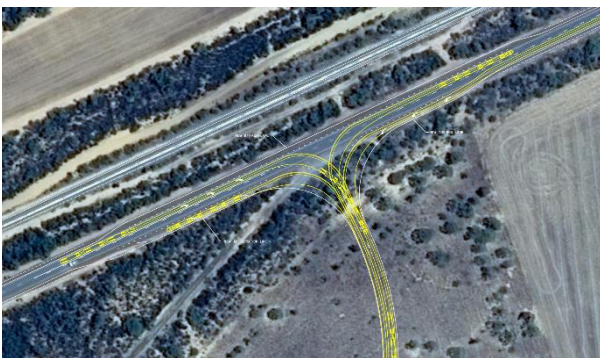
Haulage Road and Erangy Springs Road Intersection with Mt Magnet – Geraldton Road
